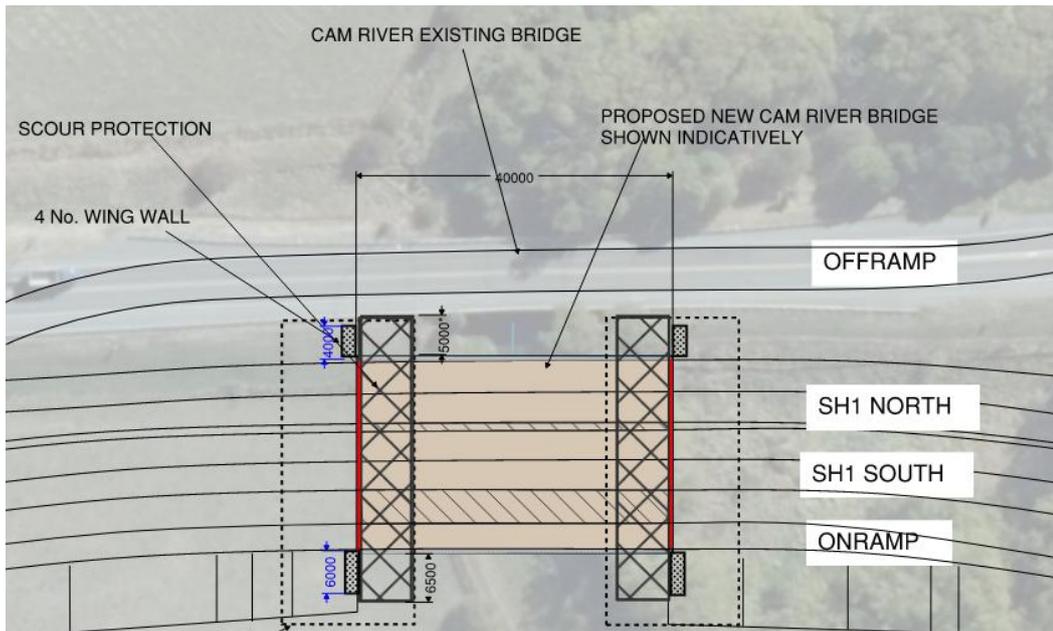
Proposed plan of Cam River Bridge (Cam River Crossing Options report, July 2025)
